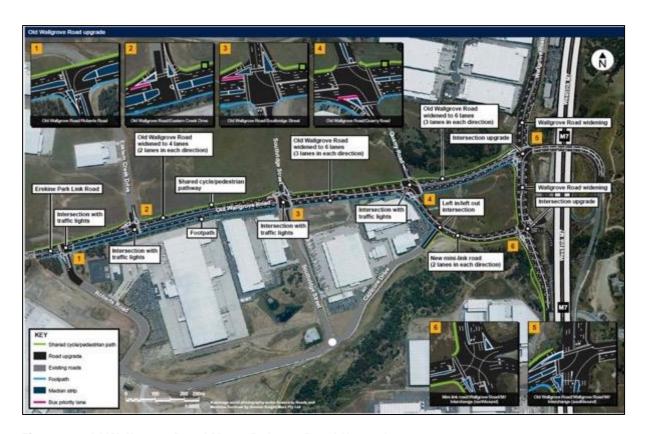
Old Wallgrove Road M7 to Roberts Road Upgrade
